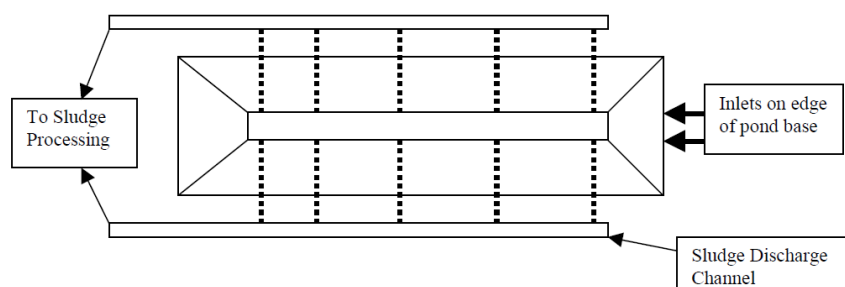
Desirable layout of anaerobic pond to facilitate desludging (Watson 1999)
